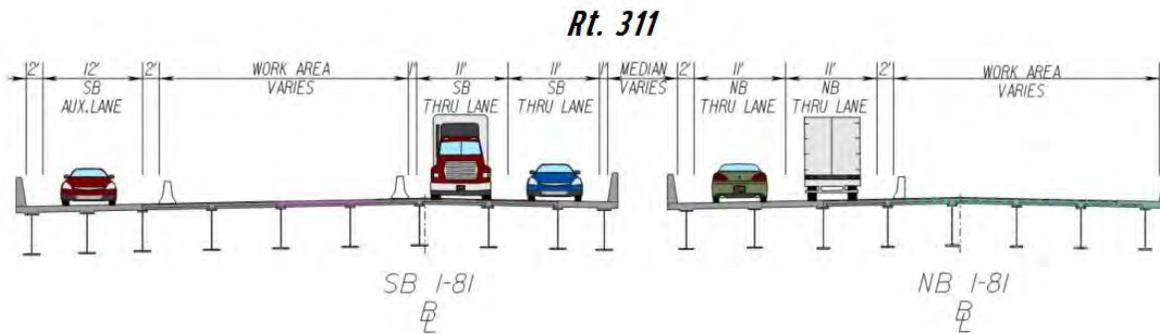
Stage 2 Construction Bridge Rehabilitation RT 311 Step 2
